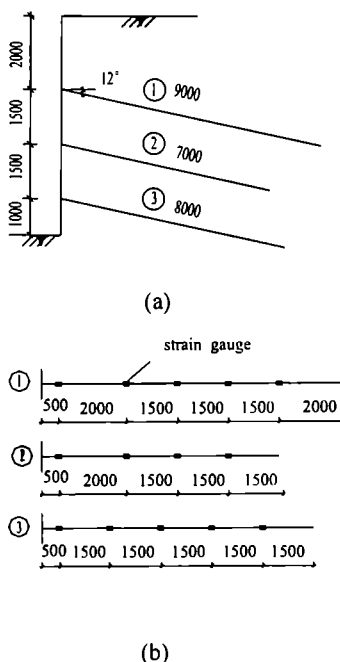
Cross-section of nailed wall 1 and location of strain gauges (mm)
